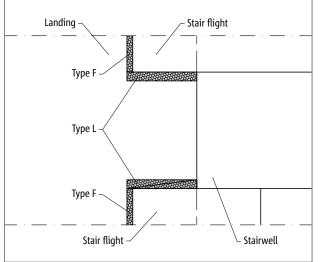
Schöck Tronsole® type F: Element configuration in plan view
